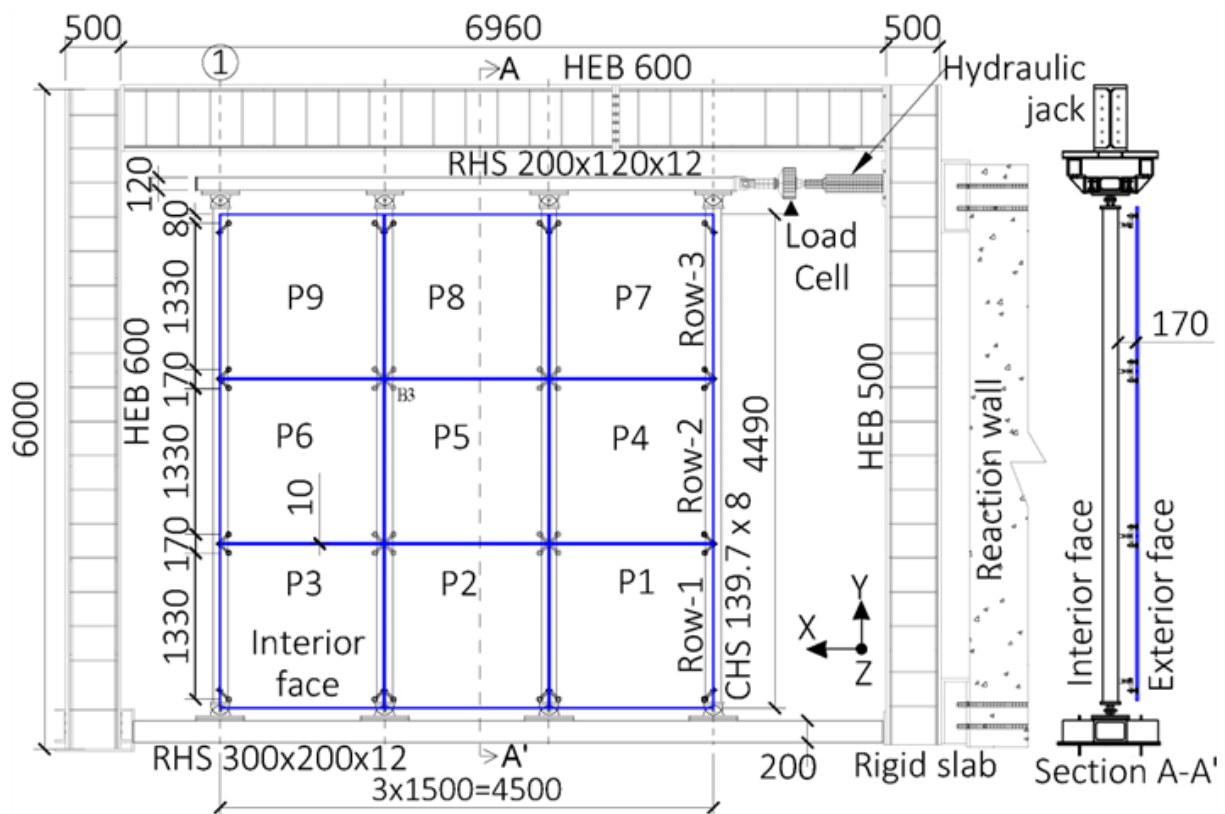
General layout for the point-fixed glass façade cyclic tests (dimensions in mm).
